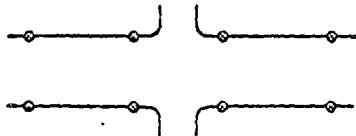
Siting recommended for the intersection of a lighted road with opposite arrangement and an unlighted road (driving on the right or left).
